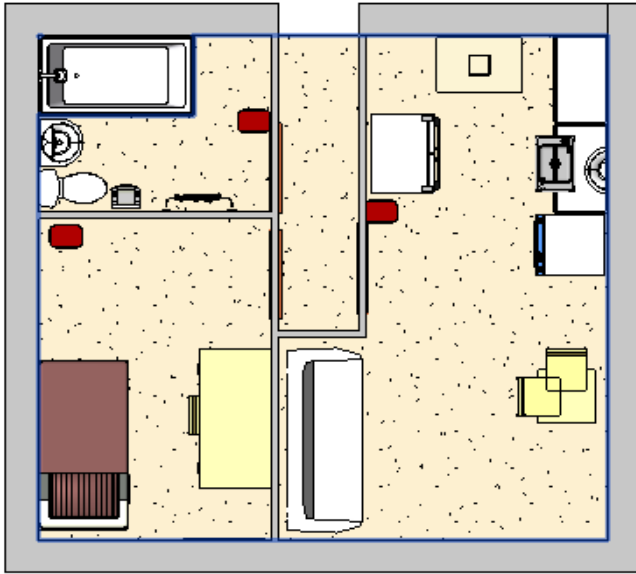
plan view of 3D BIM Revit Model of flat interior
